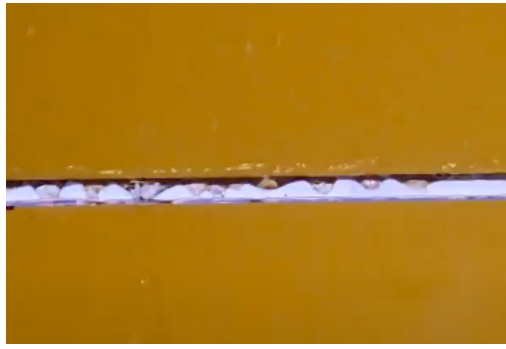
Dripping in the lower joint. Photo taken during test no. 183 with HPL panels and an 8 mm joint width.
